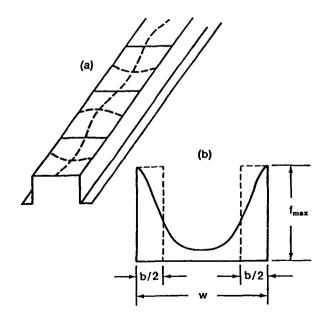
Local Buckling and Post-Buckling Strength of Stiffened Compression Element
